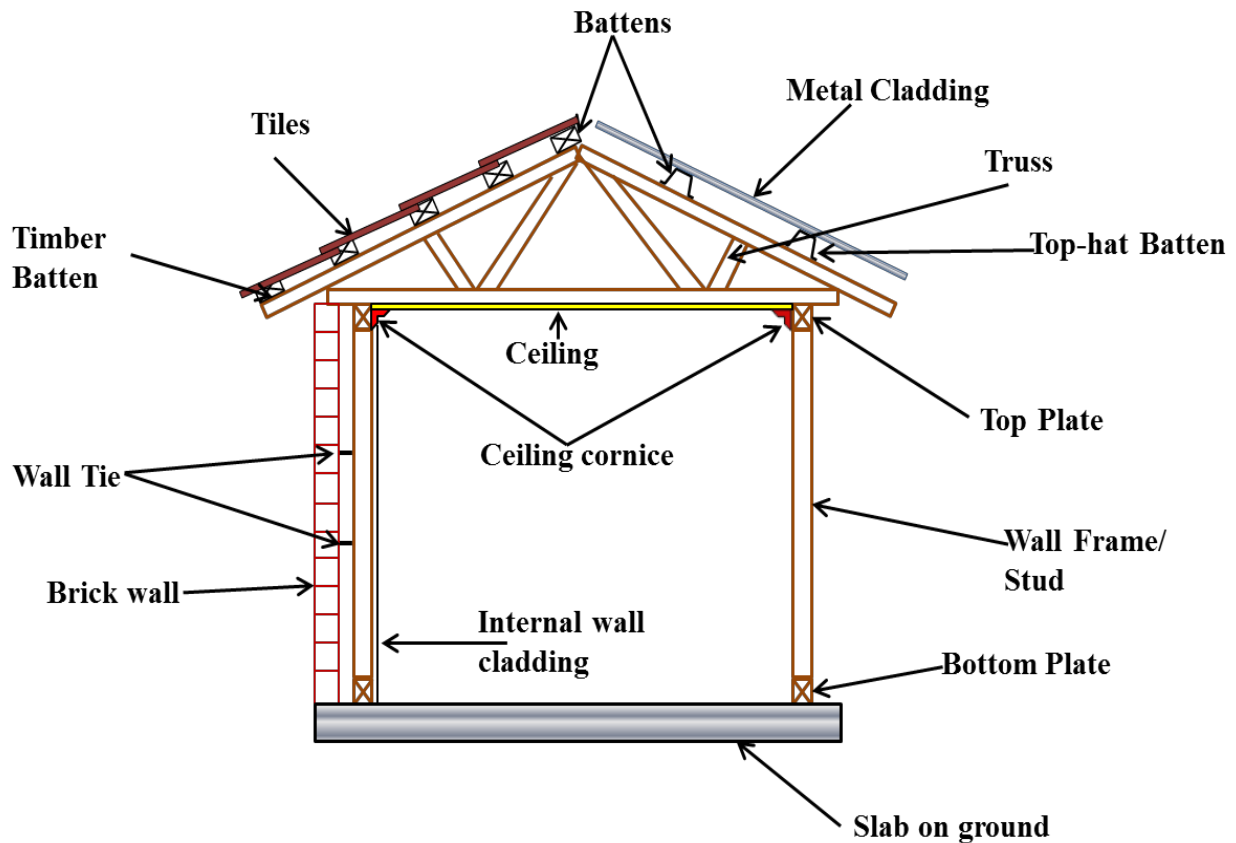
Schematic diagram of a brick veneer contemporary house structural system
